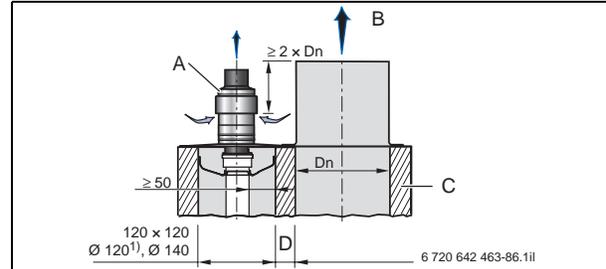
Minimum dimensions of the shaft cross-section and the shaft terminal for the flue (dim. in mm)
